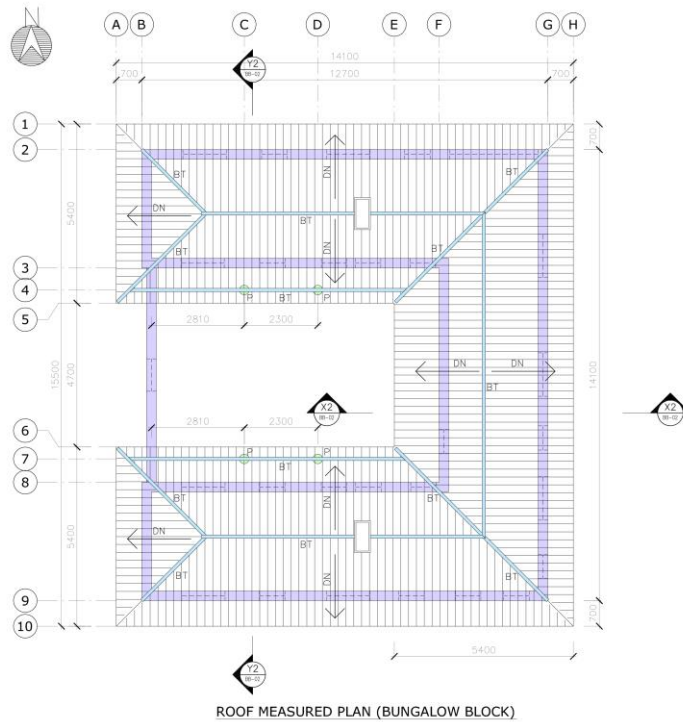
Roof measured plan of the Bungalow. The load bearing brick walls are coloured in purple. Edited by Hannah Liu.
